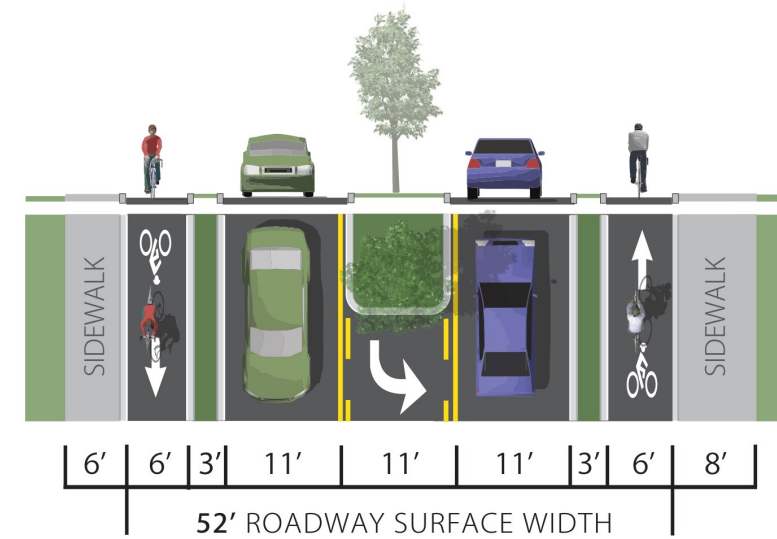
3rd Street Cross-Section | CSAS, Proposed
